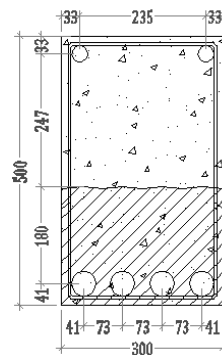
Proposed effective reinforced concrete section in the tension zone. As discussed in section 2.4.1, (Tadesse, 2015) evaluate a simple supported beam's short-term deflection. Hear under deflection is calculated by considering tension stiffening and bond deterioration zone.
